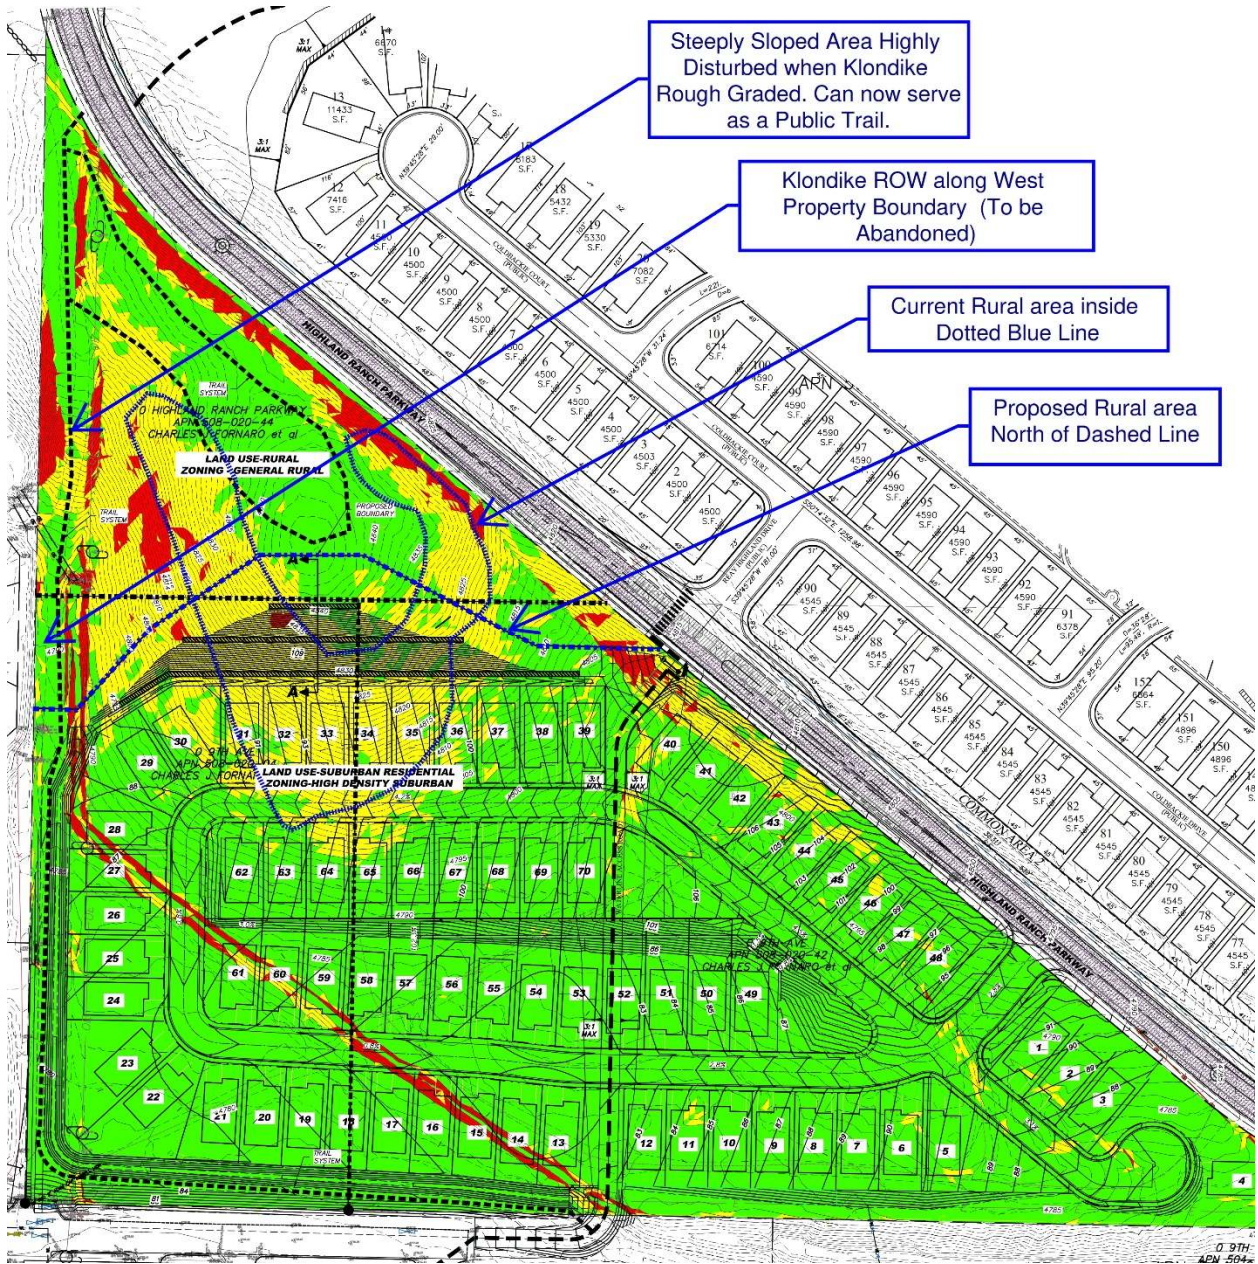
EXISTING AND PROPOSED RURAL AREA
